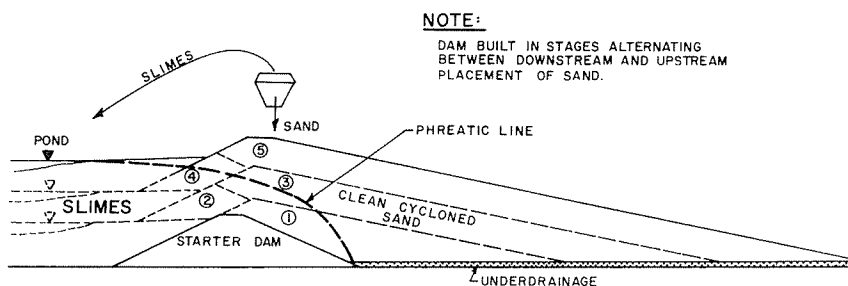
Centreline method of tailings dam construction using cycloned sand.
